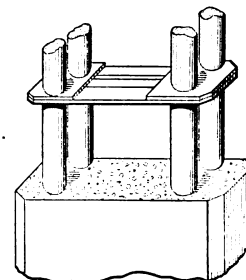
Detail Showing Construction of Pillars or Columns.
